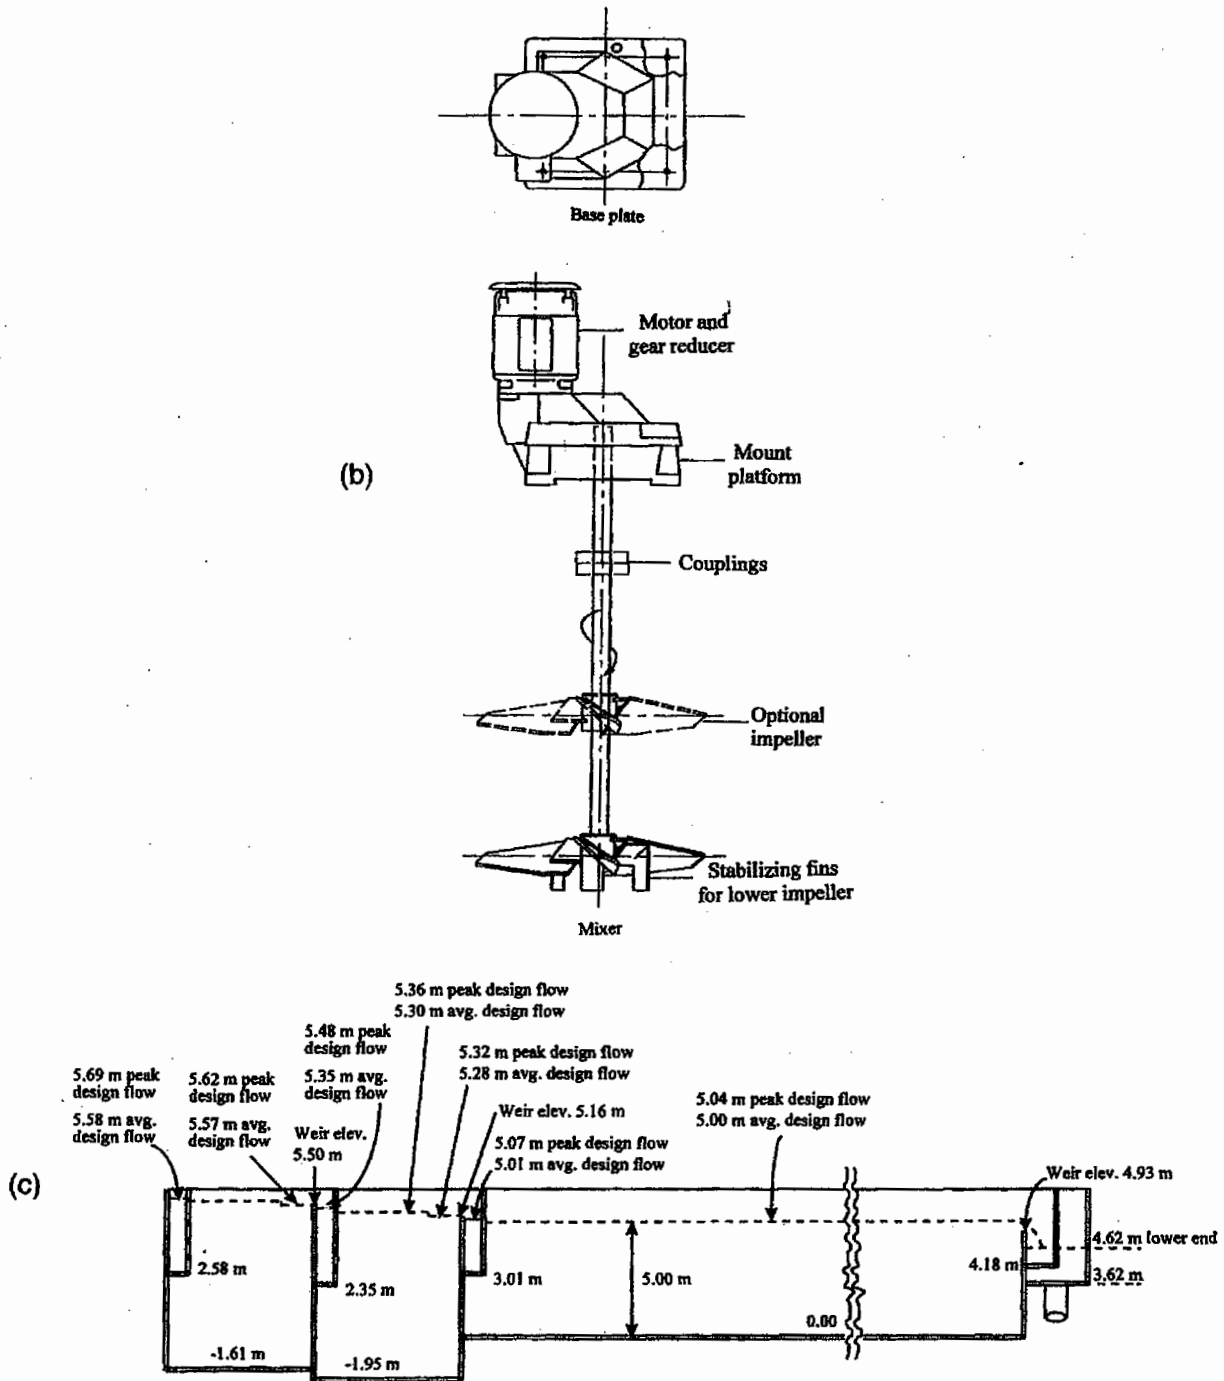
cont'd (b) mixer details (courtesy Lightnin Mixers), and (c) section and hydraulic profile.
